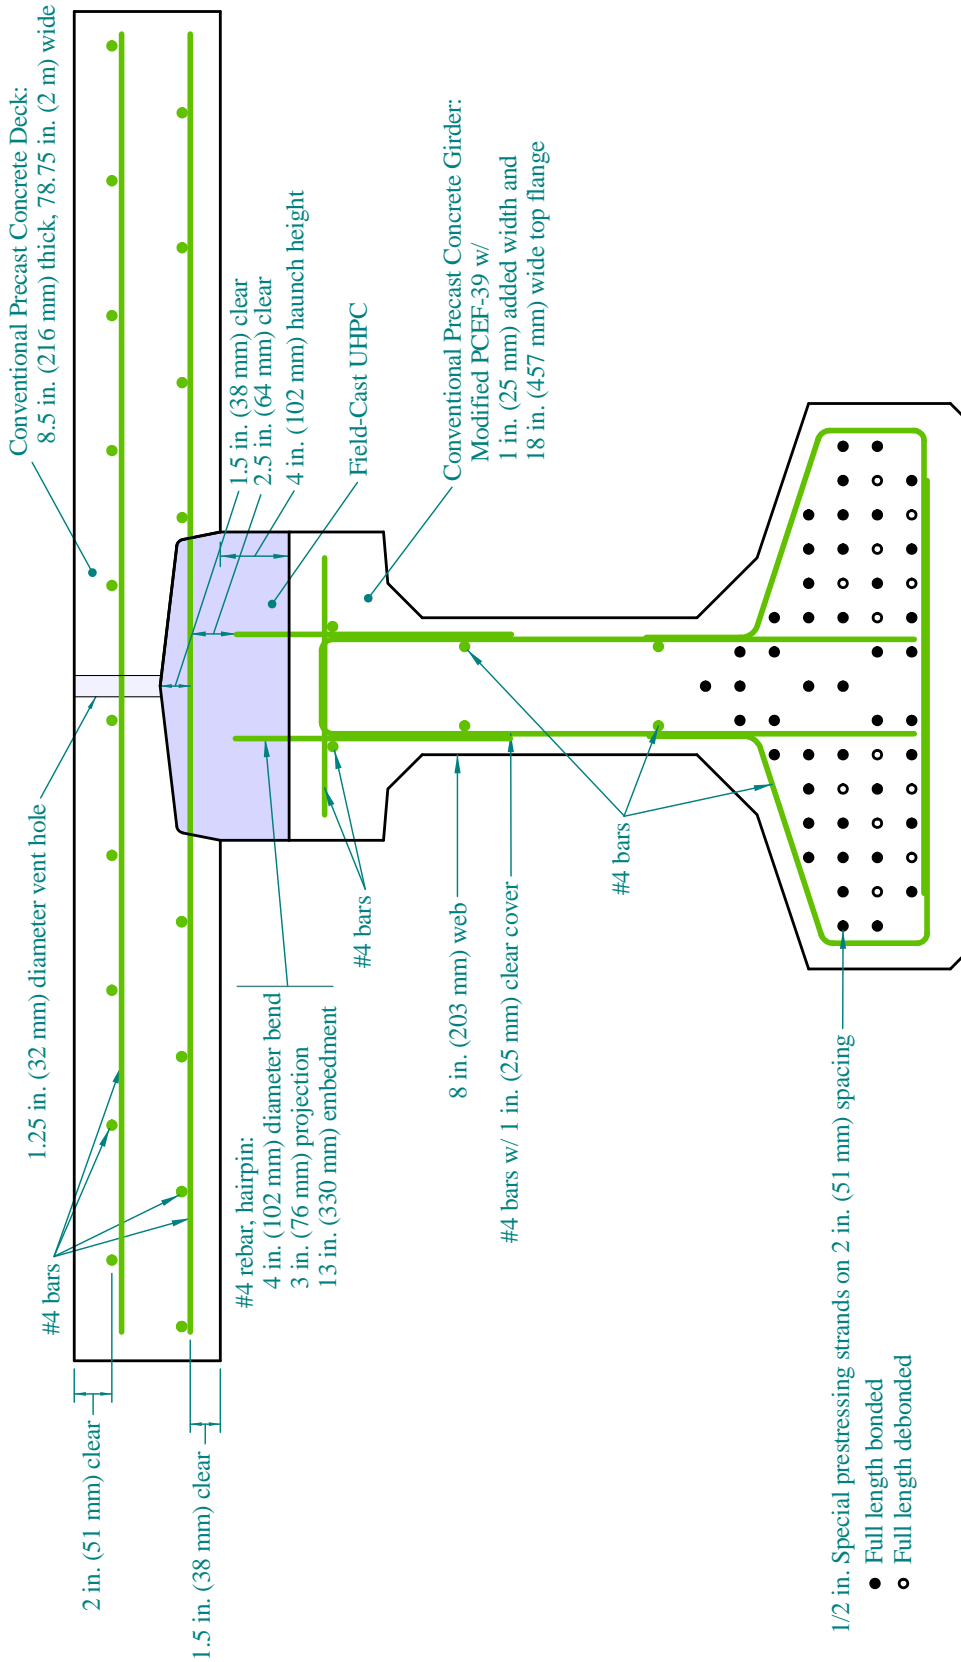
Illustration. UHPC composite connection: Transverse cross section of concrete girder connection.
